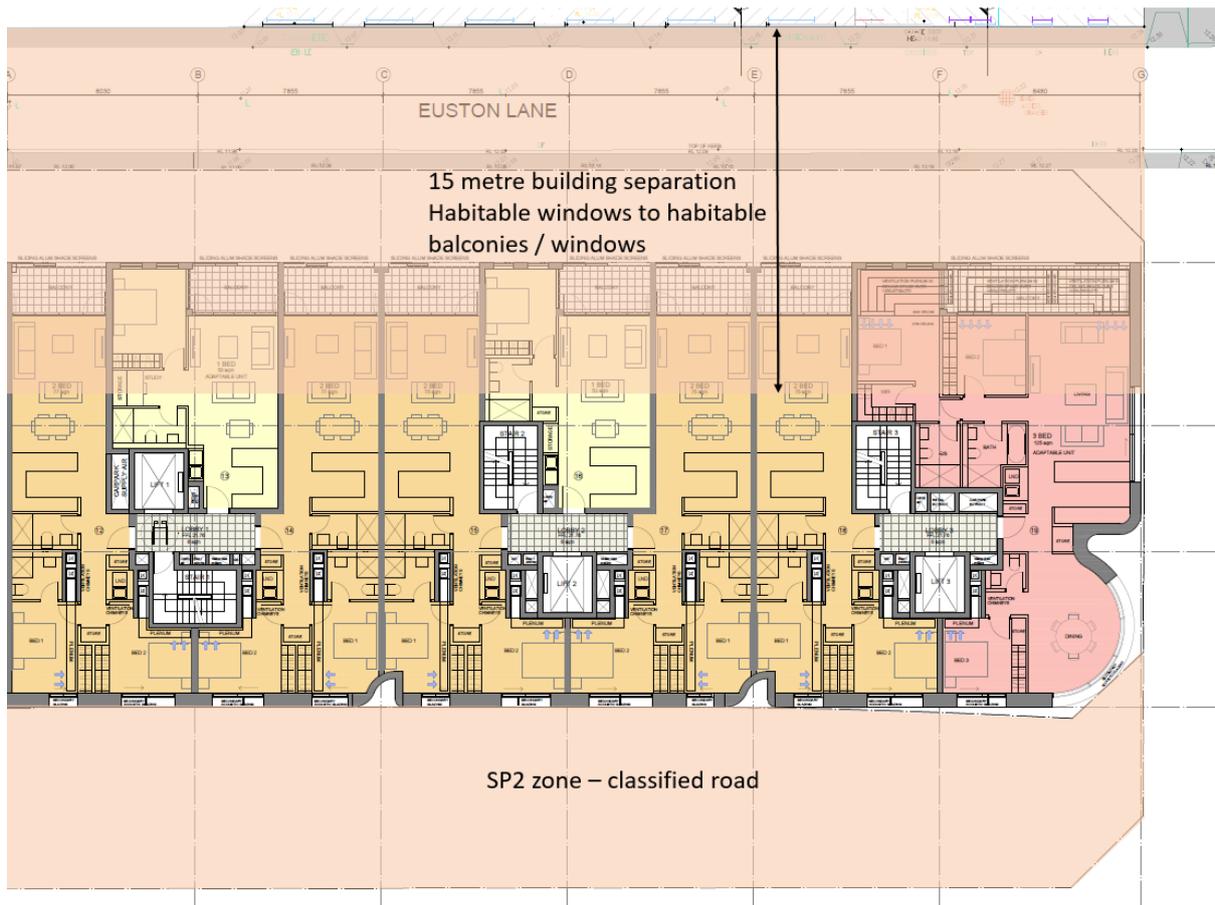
Extract from the 'Second Floor Plan' drawing by Carlisle Architects indicating the extent of building separation considerations under 2F of the ADG and SP2 zoned land.
